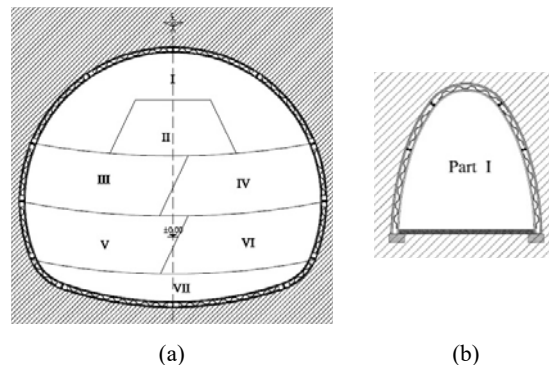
Sequence of the tunnel excavation; (a) The main tunnel, (b) Velenjak canal
